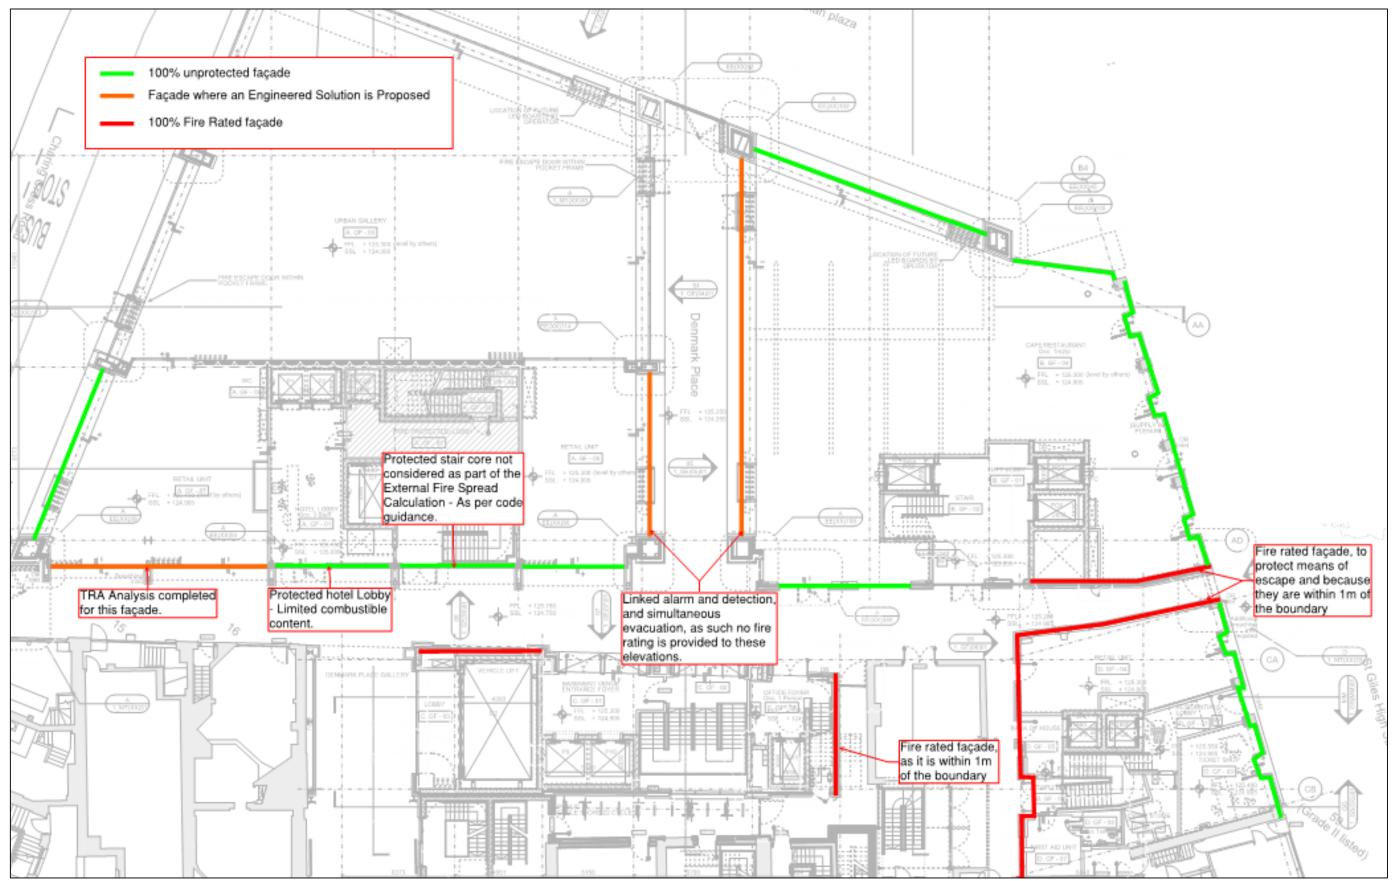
2: External Fire Spread Facades for Buildings A - D (Ground Floor)
